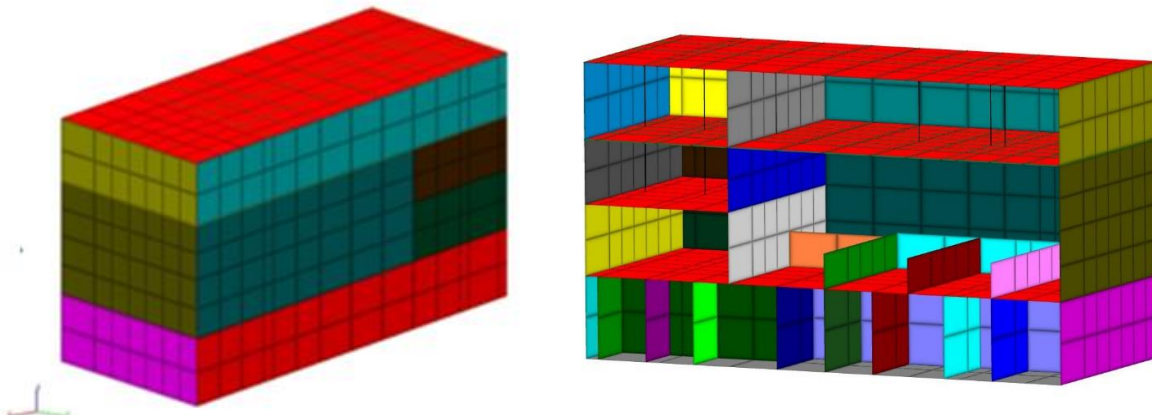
External and Internal Views of Shearwall Building Model Including 40 Nonlinear Wall Panels
